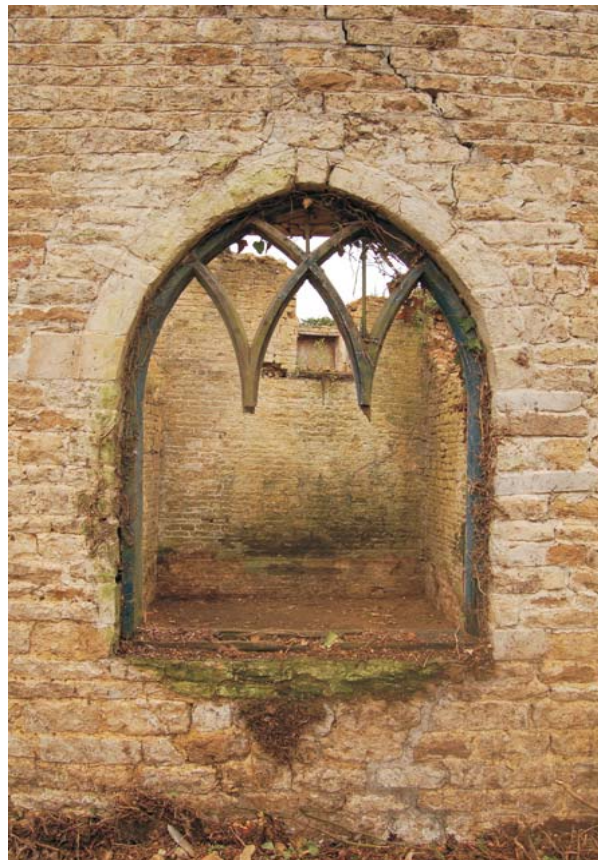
Tracery window in the "Chapel" looking north, exterior ground floor
